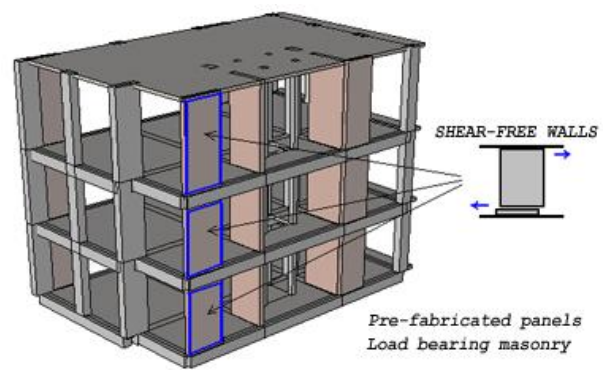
Placement of concrete shear walls in a structure (mahve, nd).
